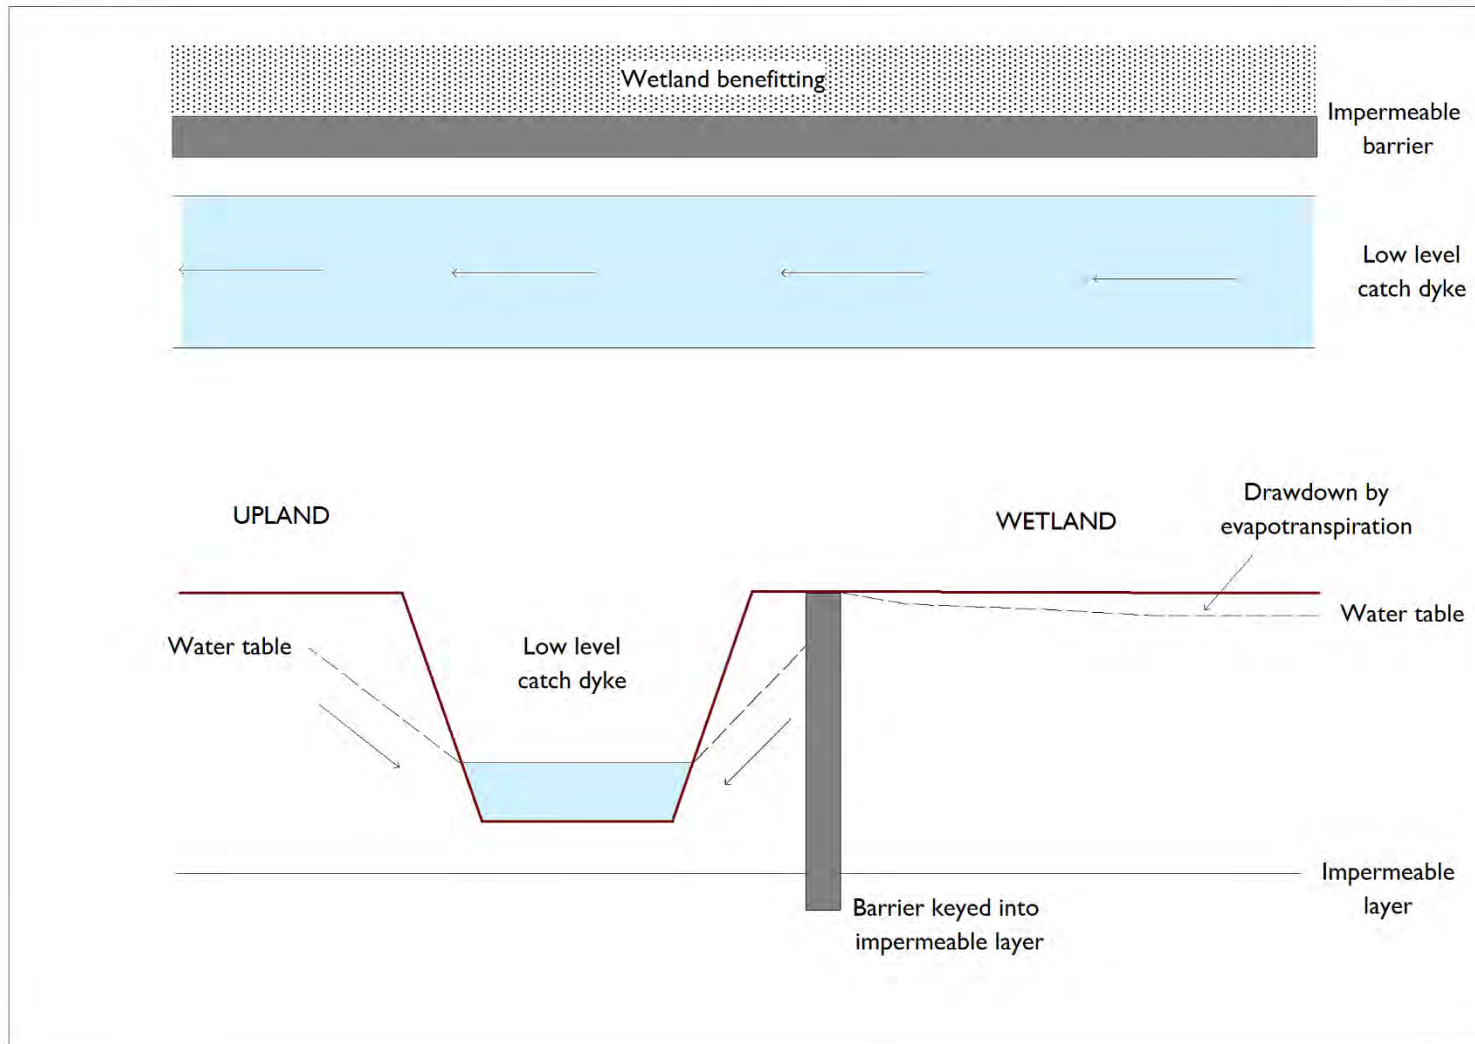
Seal Off Wetland. Planform above, cross-section below.
